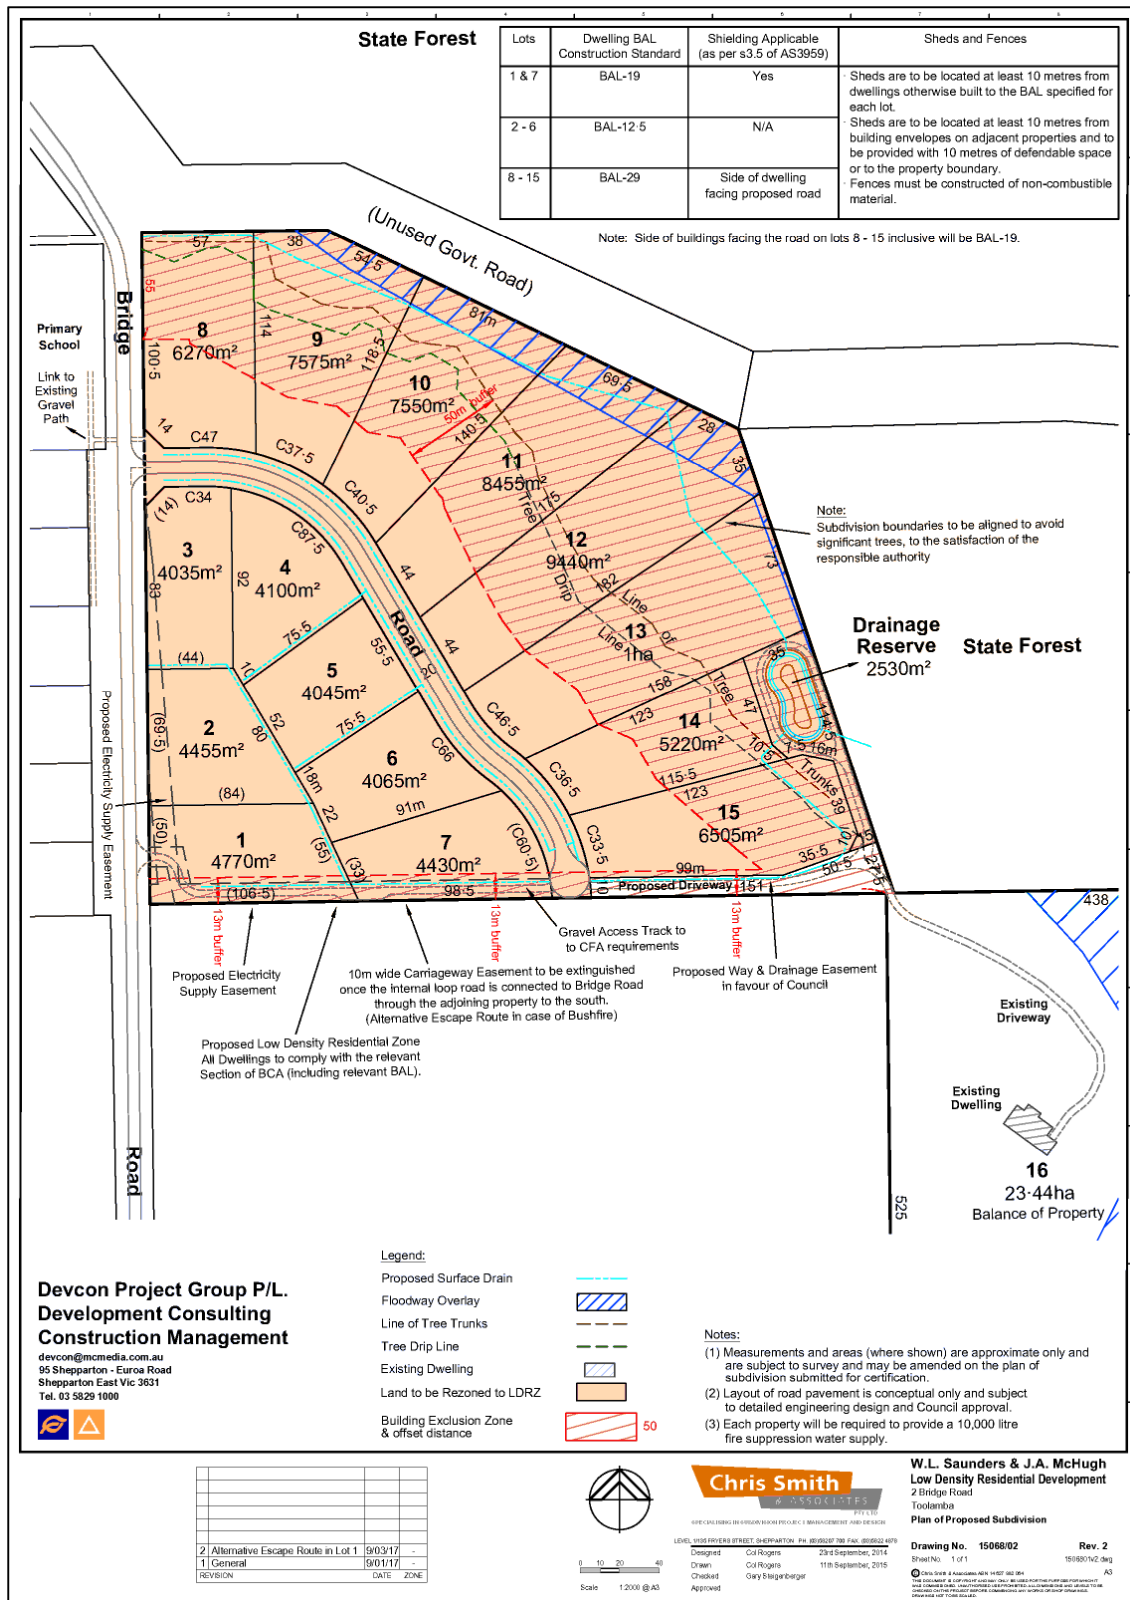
Plan of proposed subdivision of Meadow Wood Estate, 2 Bridge Road, Toolamba.
